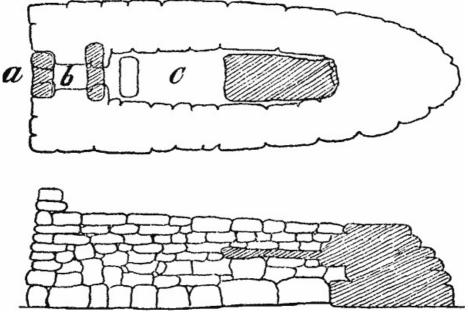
Nau d'Es Tudons, plan and section. (After Cartailhac.)
